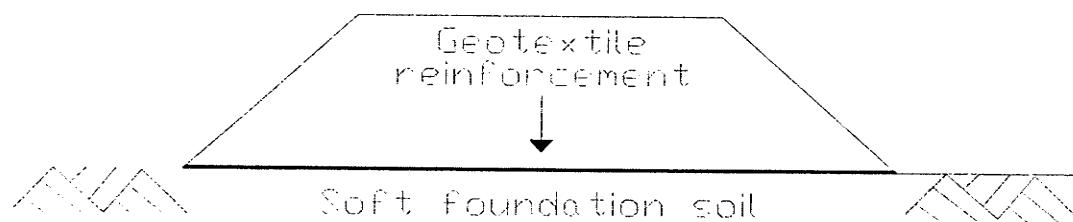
Geosynthetics used as reinforcements in road embankments
